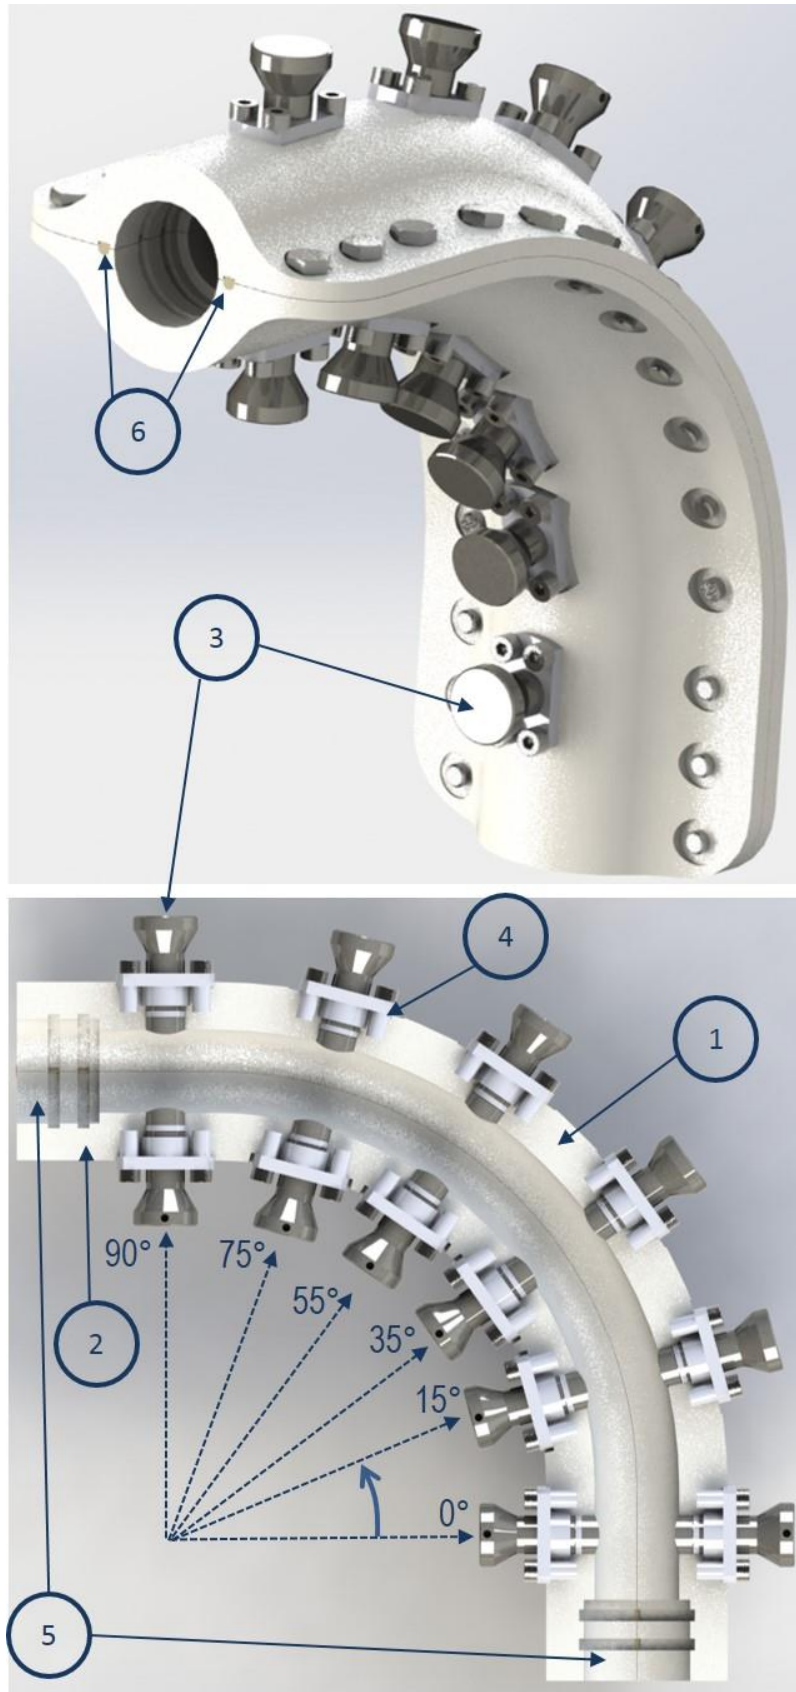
Fully assembled elbow design consisting of twelve X65 samples located on the inner and outer radius of the elbow
